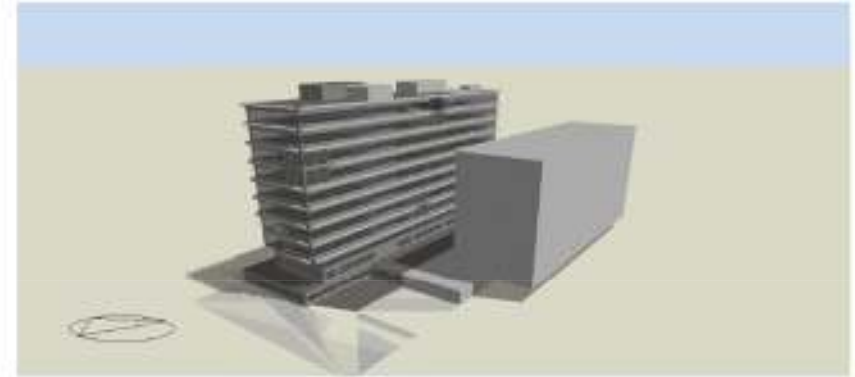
DesignBuilder 3-D Model of the Building (0° Degree)
